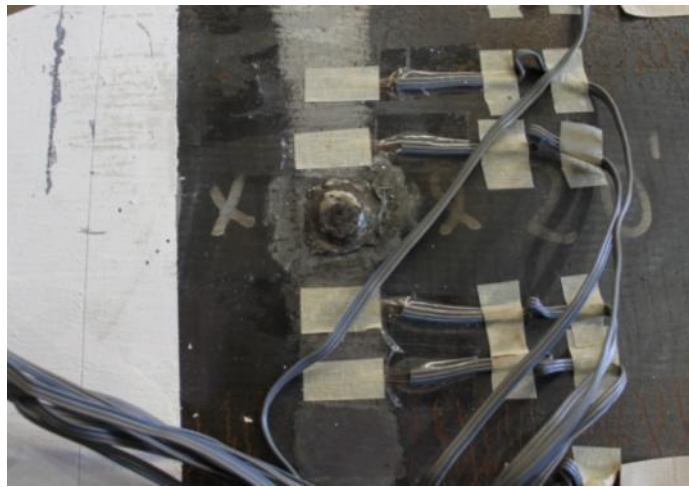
Typical Puddle Weld with Trimmed Decking from Test 5
